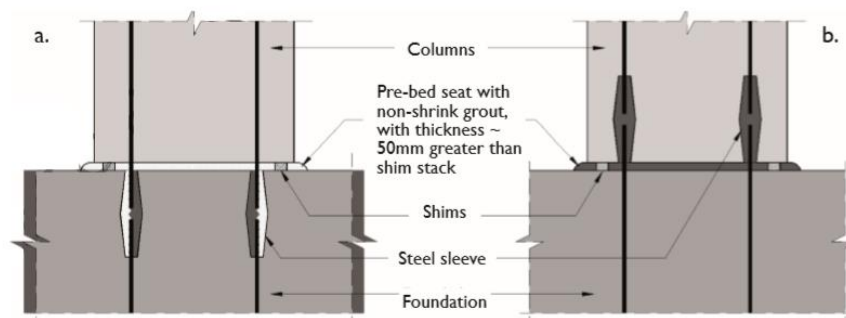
Column-to-foundation connections with steel splice sleeves (Other details not shown for clarity)
